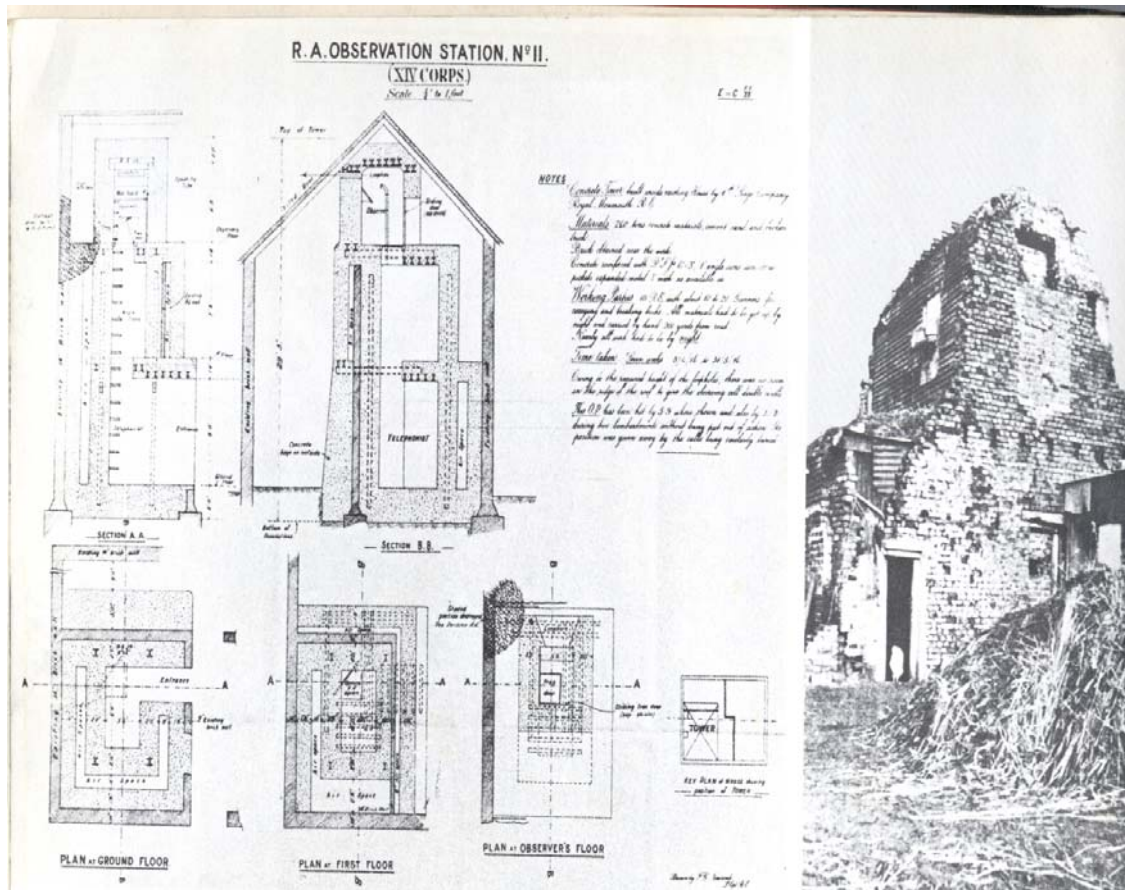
f British observation posts constructed within existing buildings in Flanders: drawing showing use of air space construction
